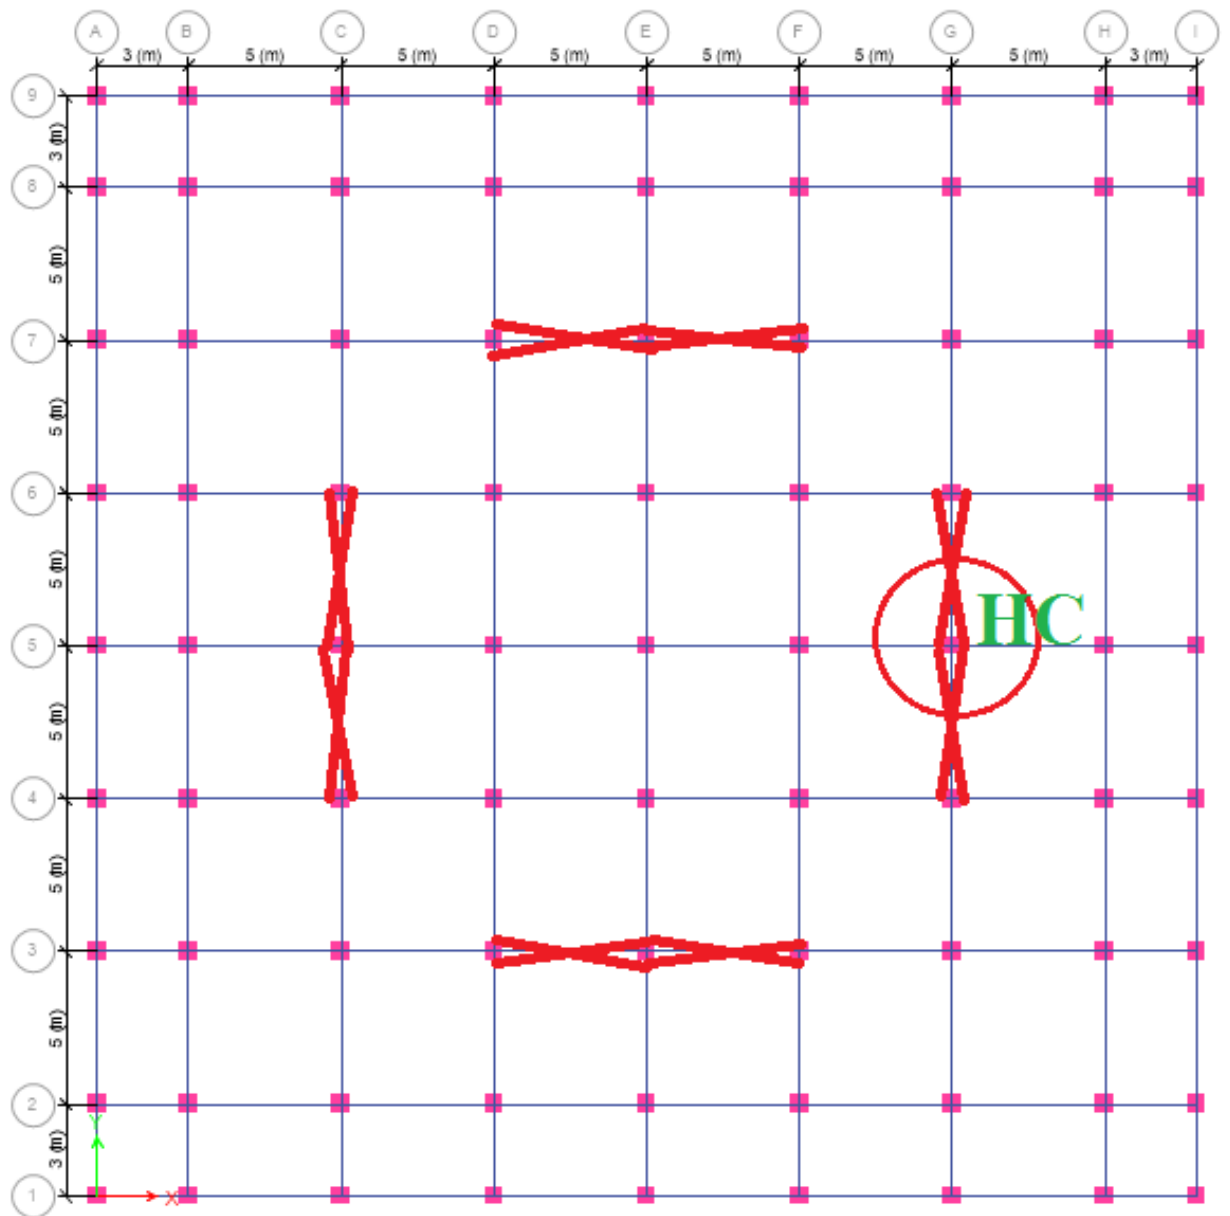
Floor plan with position of bracing and highlighted column (HC) of the RC building.
